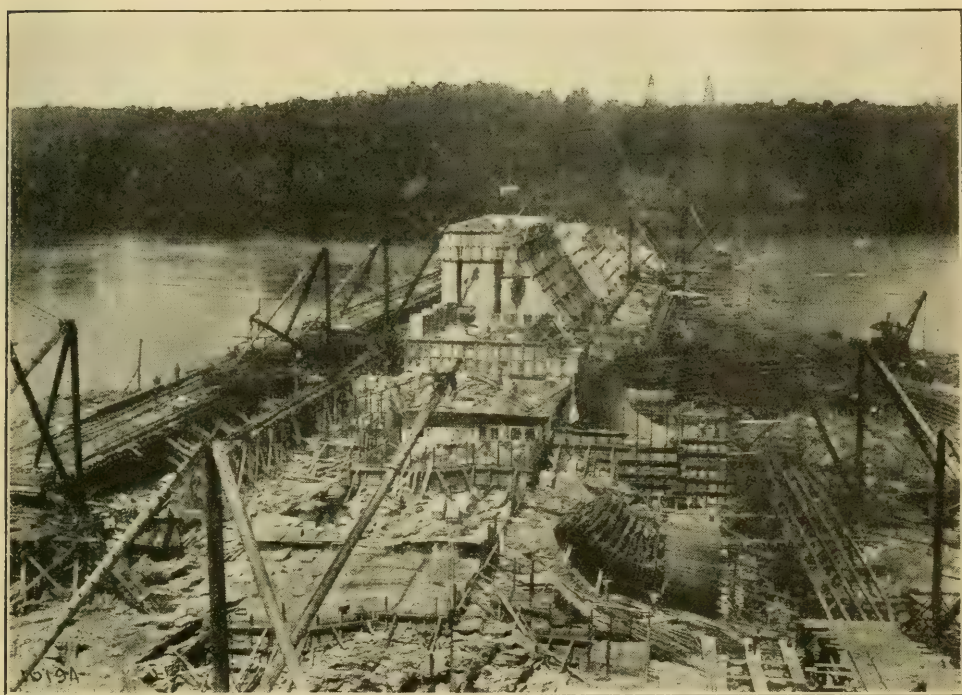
CONDITION OF WORK, JULY 2D, 1913. FIRST STAGE OF CONSTRUCTION OF POWER-HOUSE STARTED.
